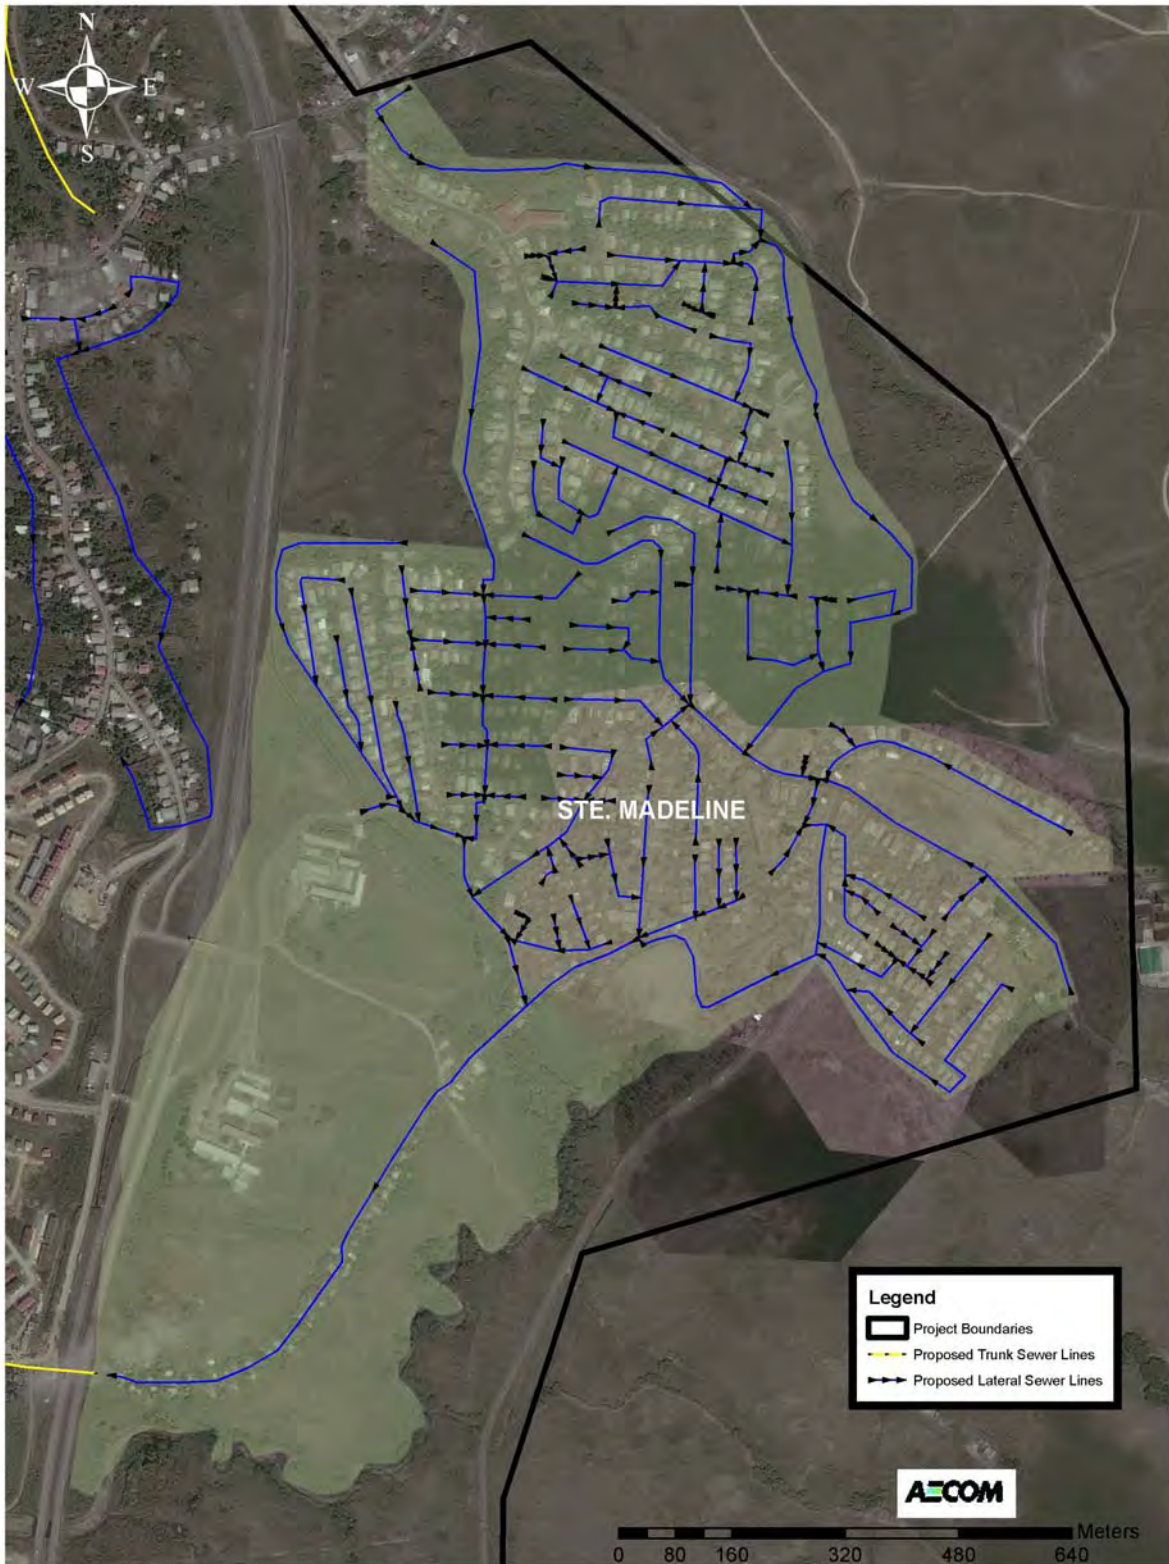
Ste. Madeline Subcatchment New Sewer Layout
